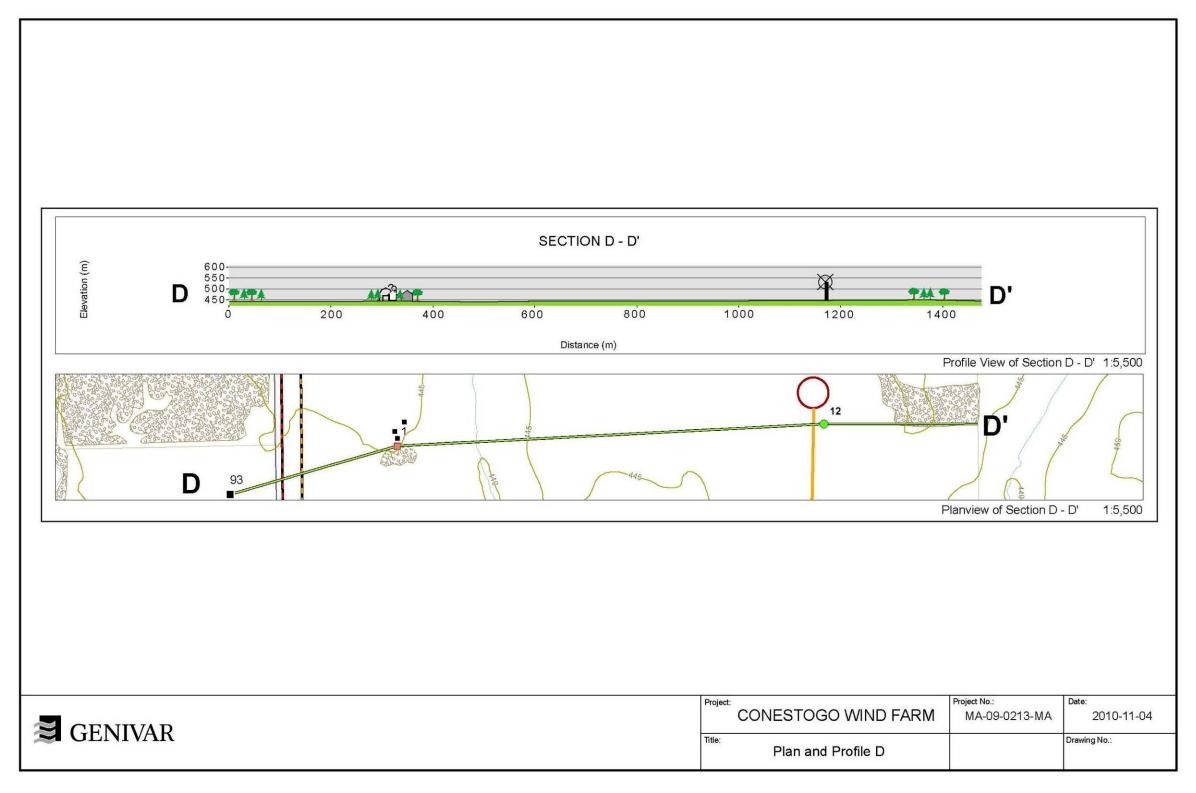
Plan and profile drawings of CHL 3 illustrating general landscape composition of lot with respect to height of existing structures.
